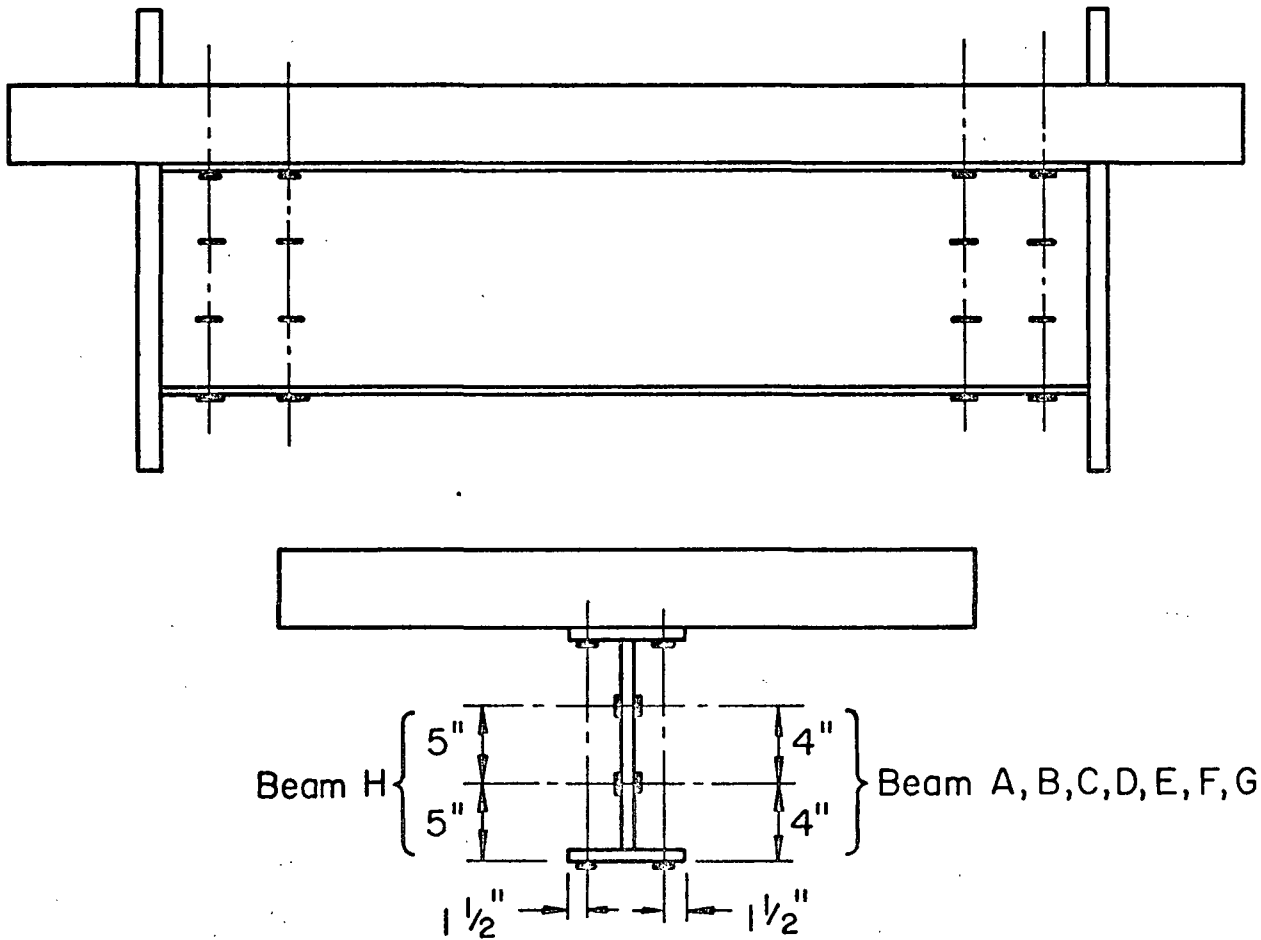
STRAIN GAGES ON STEEL BEAM
